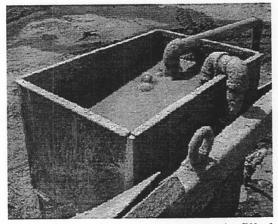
Shear pump reservoir filled with fully mixed bentonite slurry.
